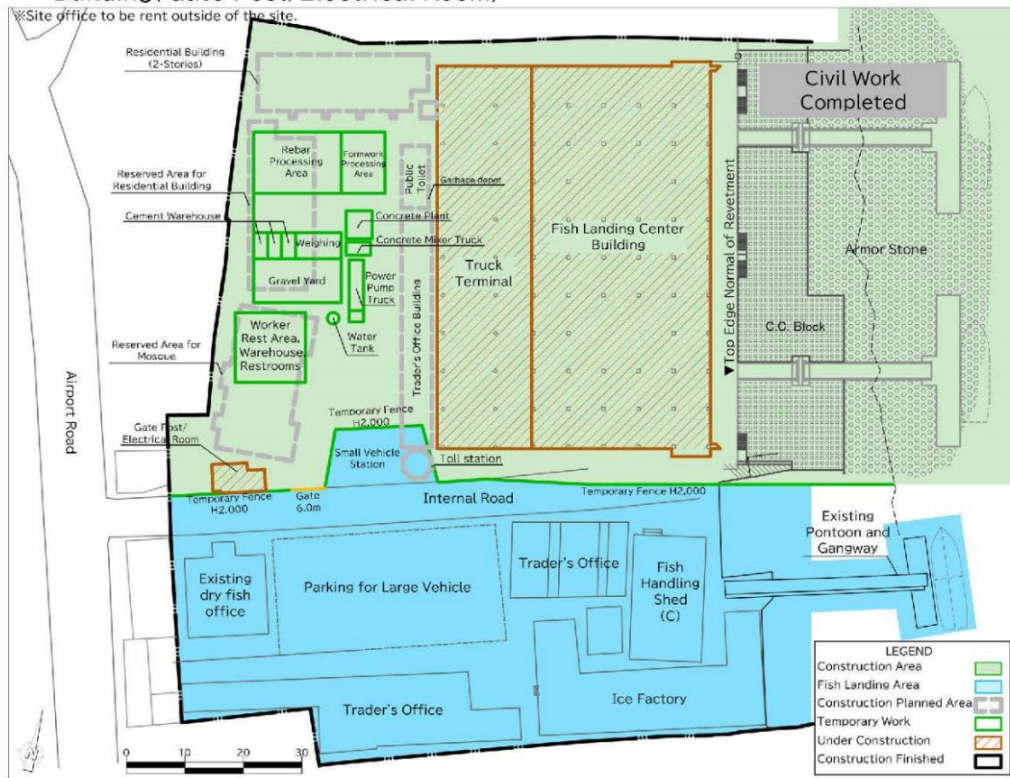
Temporary construction plan for each phase of building construction, (1) and (2)
